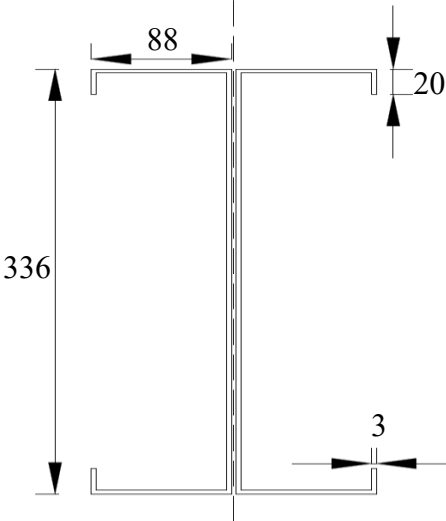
Dimensions of the back-to-back channel (dimensions in millimeters).
